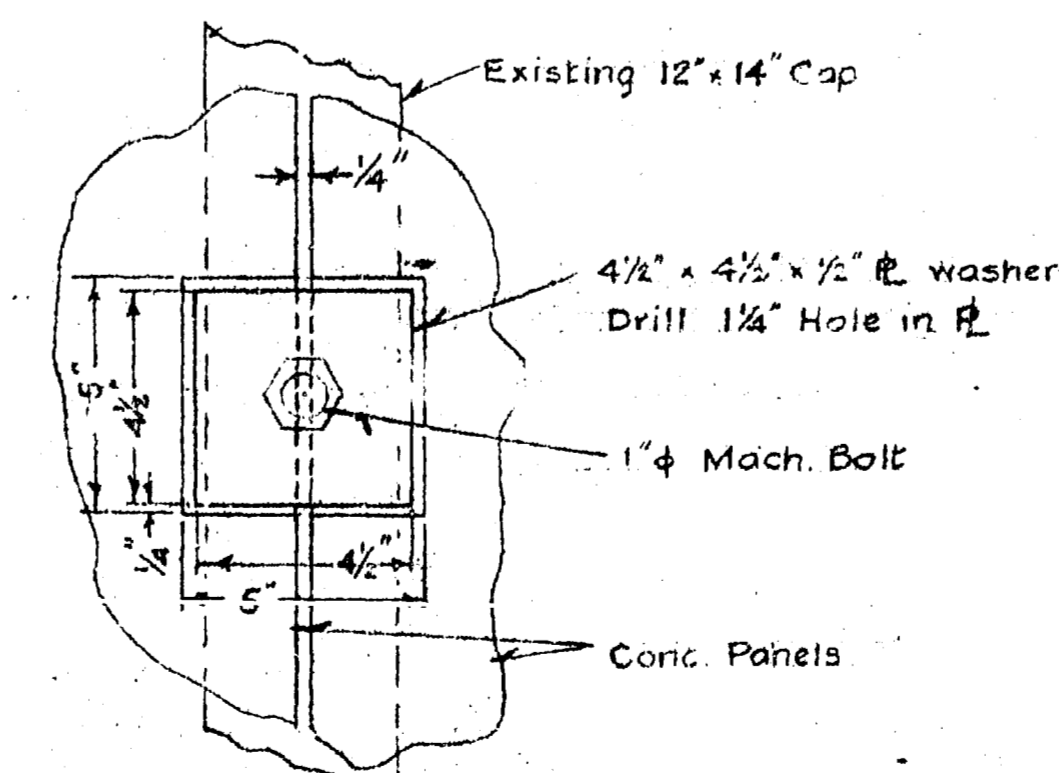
PLAN VIEW OF PANEL TO CAP BOLT CONNECTION
